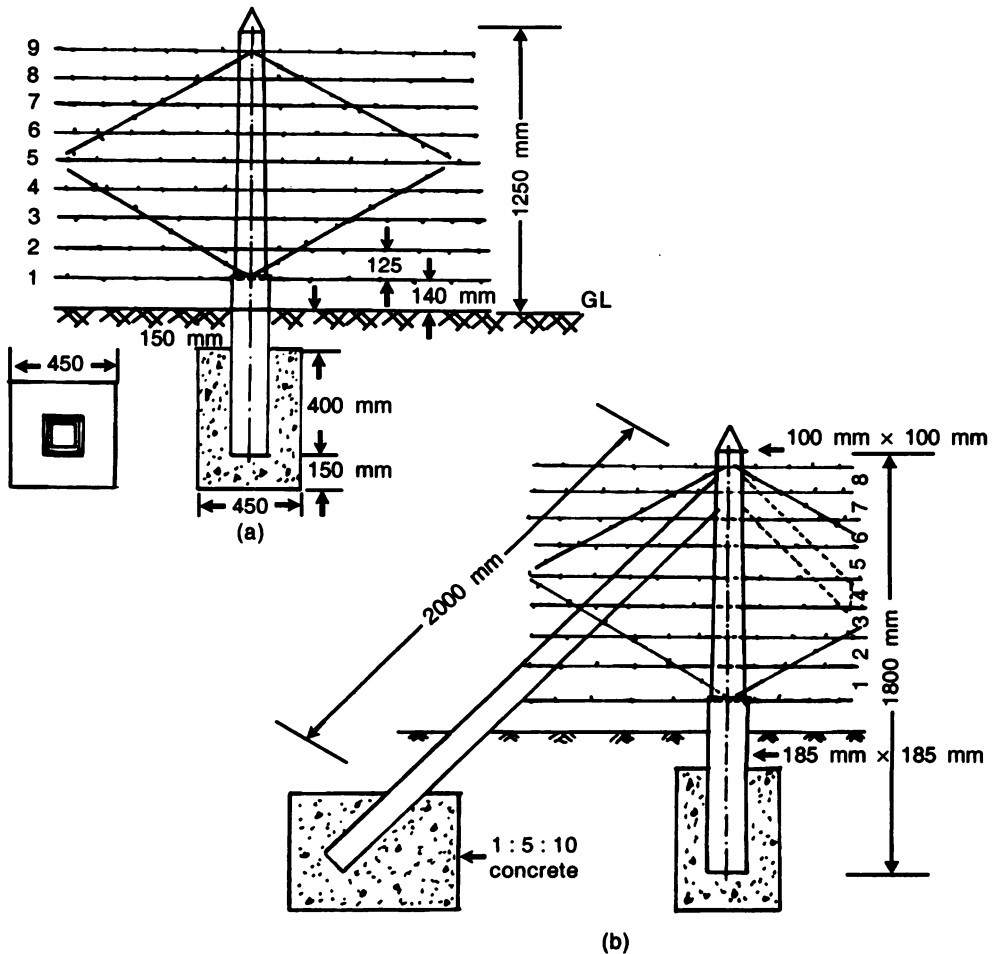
Barbed wire with reinforced concrete posts 185 mm x 185 mm at bottom tapered to 100 mm x 100 mm at top and 1.8 m in length: (a) Intermediate posts (b) End and other anchoring posts in long stretches with struts (horizontal rows 5 to 9 numbers as desired).
